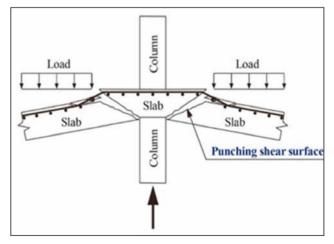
Schematic diagram showing the loads and a potential punching shear failure plane.
